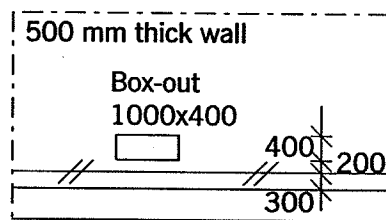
1 m long opening placed 200 mm above construction joint.
